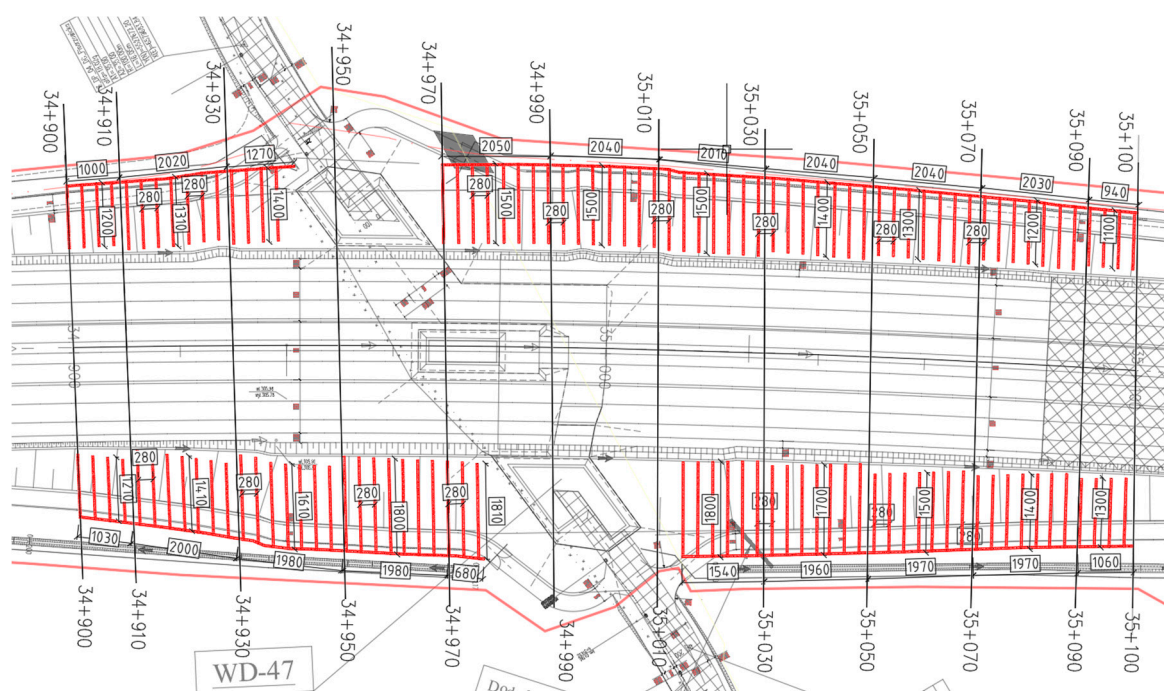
Segment of CDMM panel arrangement undergoing assessment (panels in red). Based on “Working design for excavation stability for S1 Dankowice—Suchy Potok road”.
